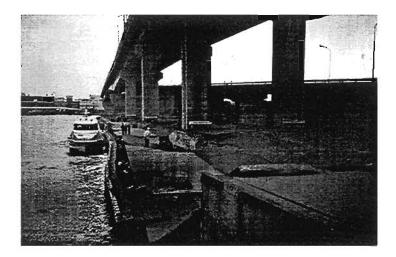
Extensive lateral movement of quay walls at the Maya Futo wharves
